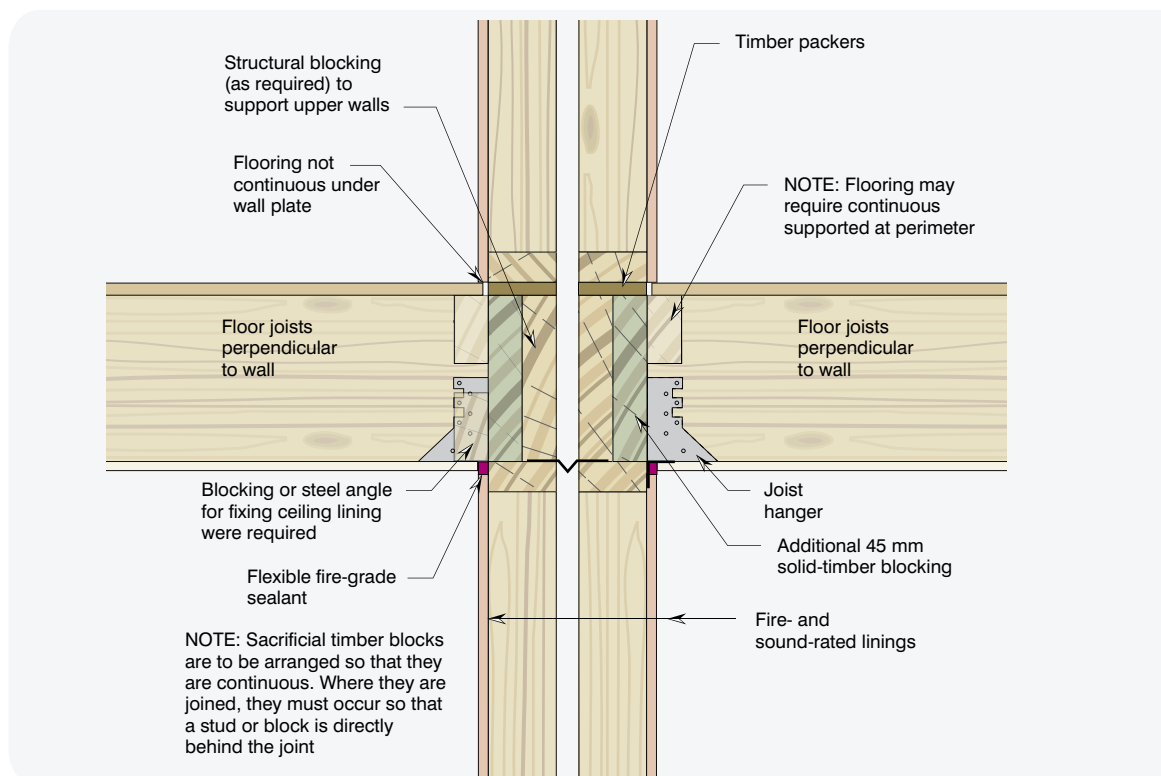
Joist perpendicular to the wall, wall stud not continuous through junction – FRL 60 minutes – elevation view.
